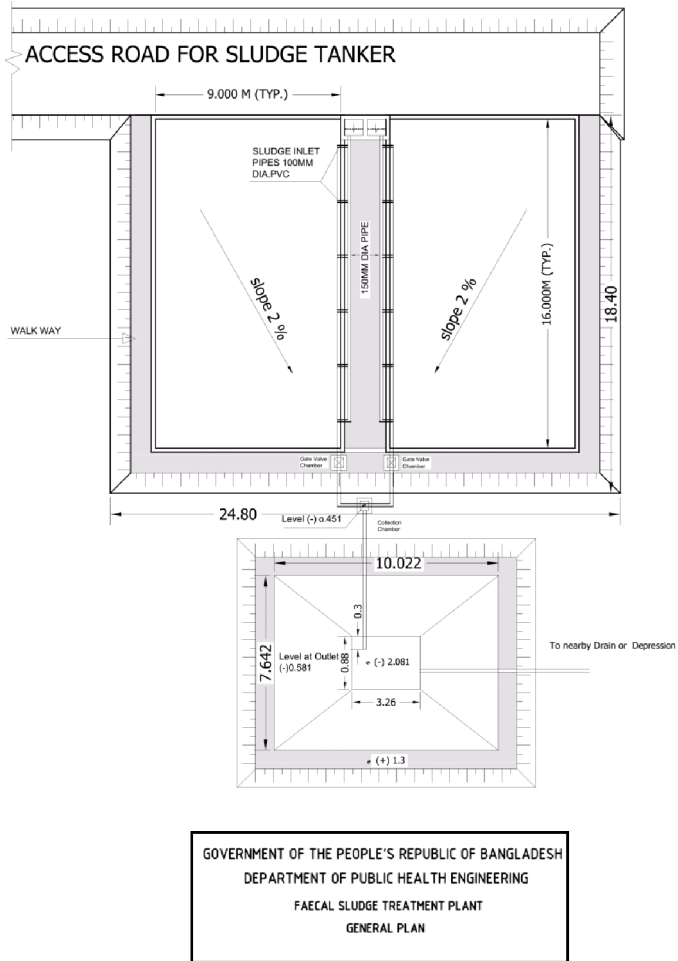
General plan of the beds of Faecal Sludge Treatment Plant
